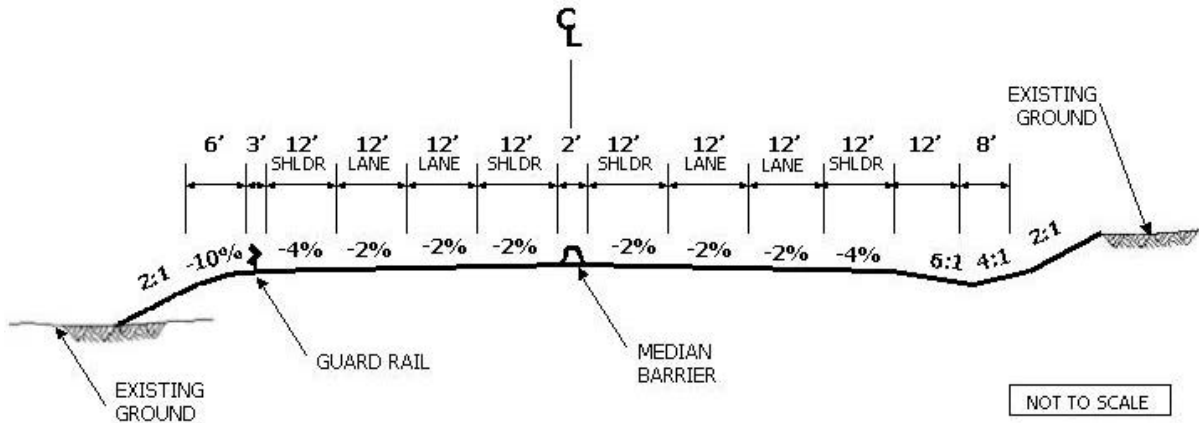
Robinson Corridor (New Highway) Typical Section
